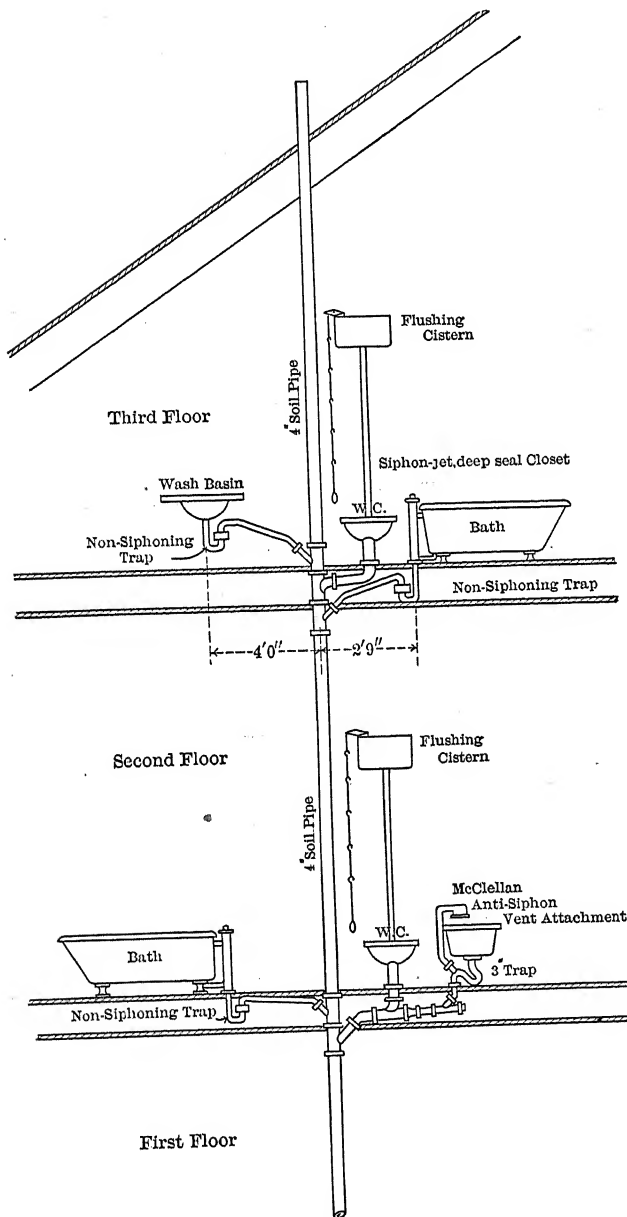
Section of House Showing Arrangement of Plumbing as Proposed.
